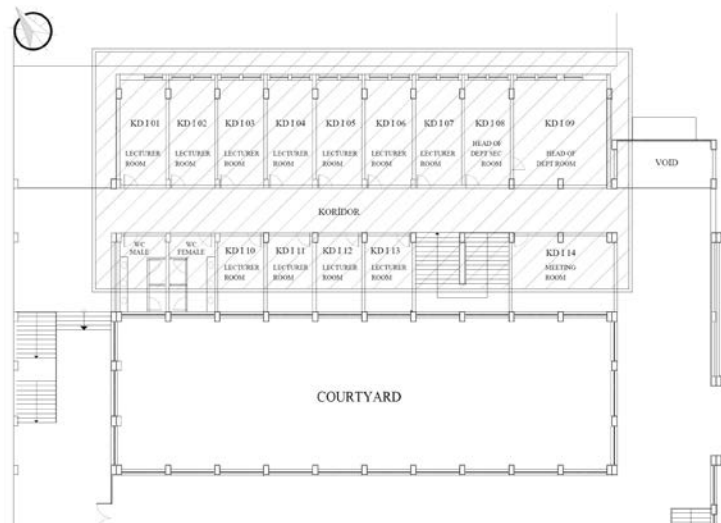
ESTU Industrial Engineering Department First Floor Plan
